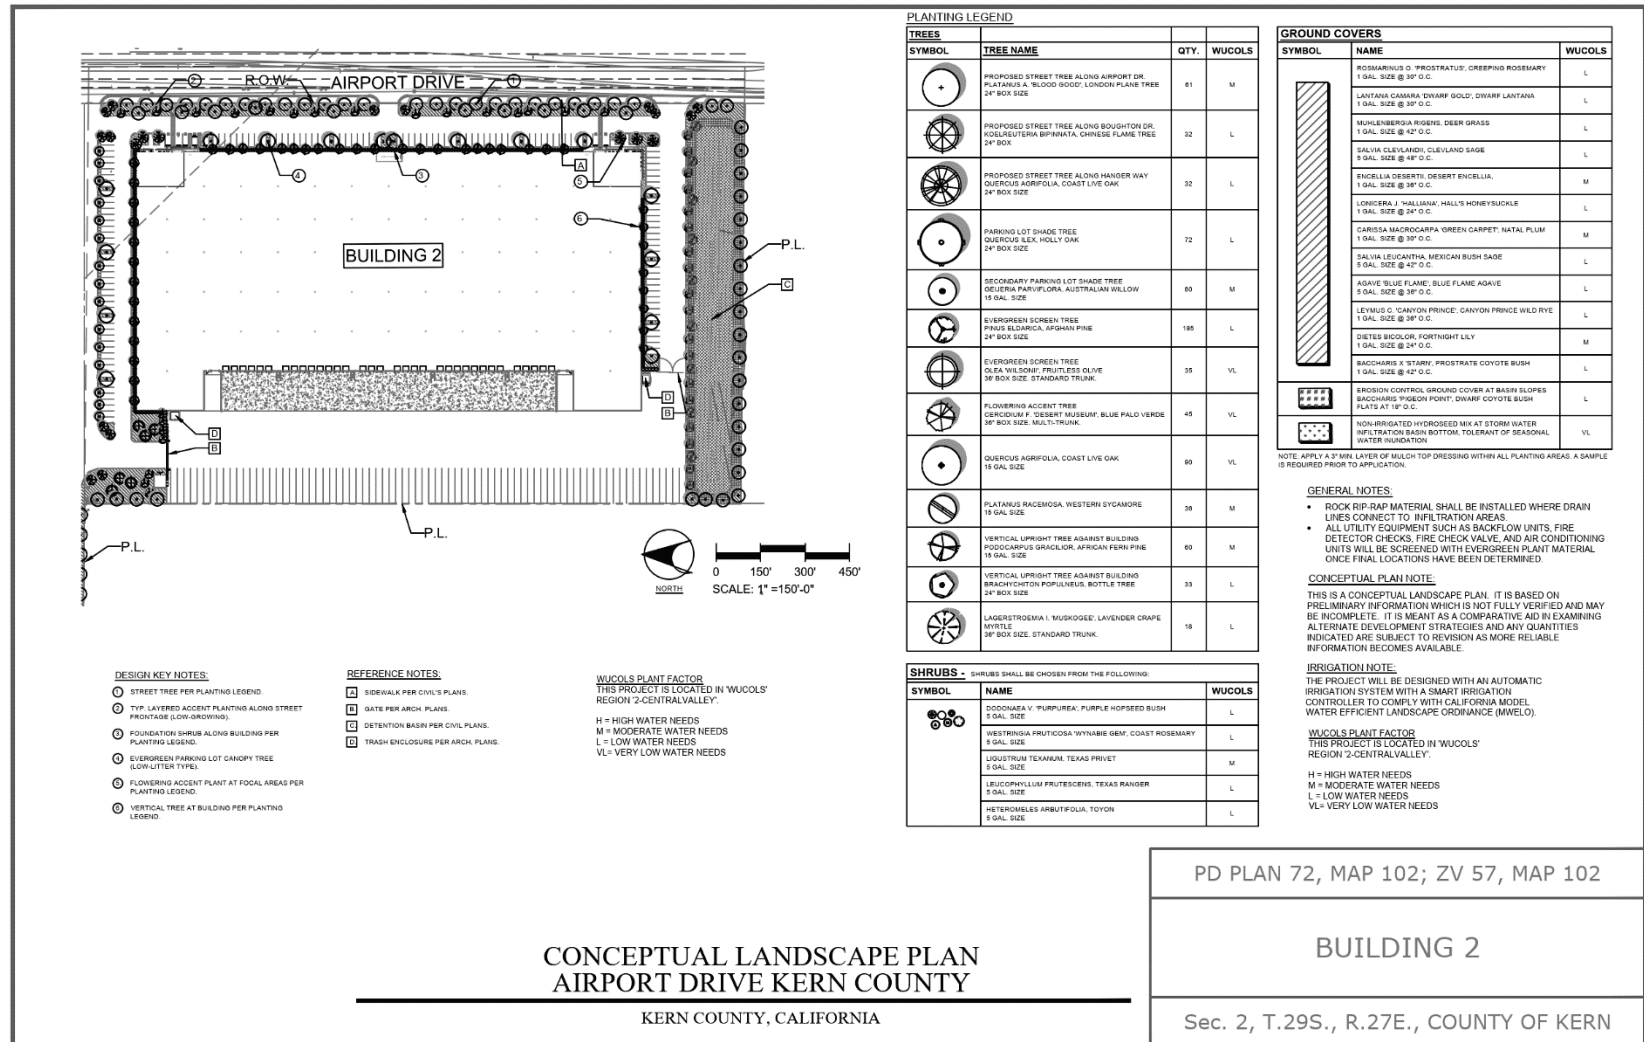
Precise Development Plan - Building 2 Landscape Plan
